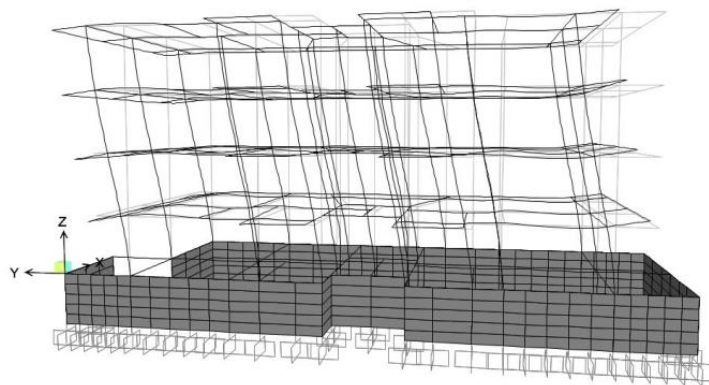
Deformed shape of the building under earthquake loading in the positive Y direction.
